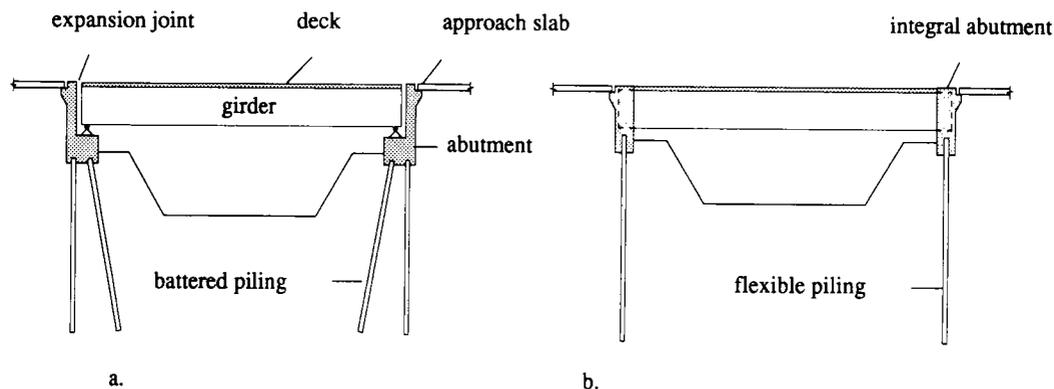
Types of bridge abutments: (a) bridge with expansion joints; (b) jointless bridge with integral abutments.
